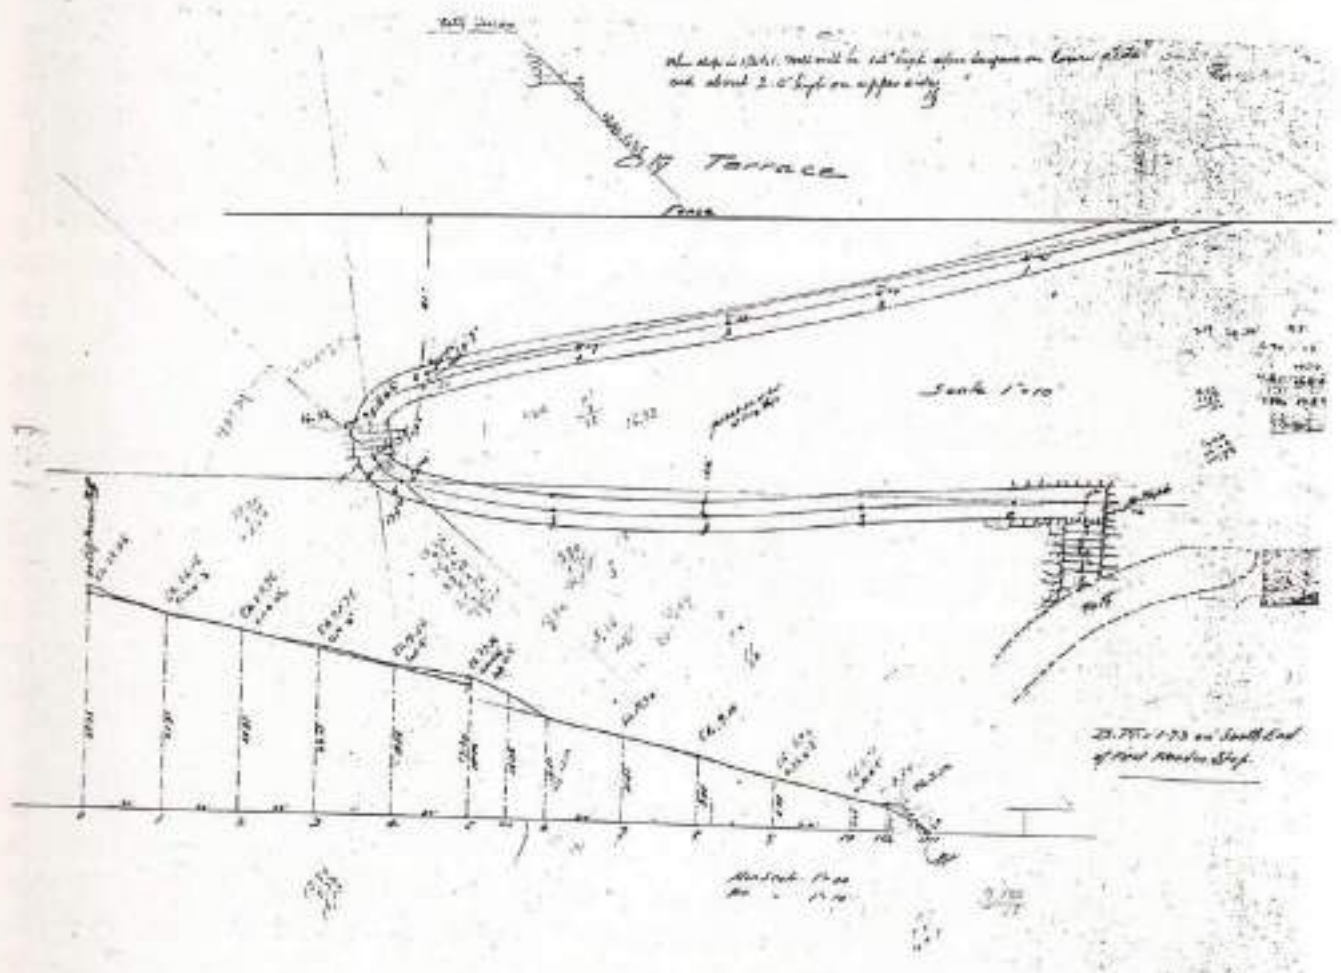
Plan and section showing walk alignment and stairs through upper Downing Park to access City Terrace. Untitled and undated. CoN
